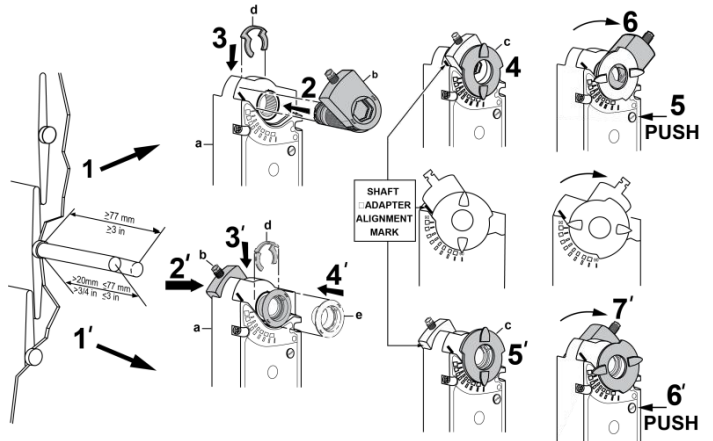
Shaft Adapter Placement for Counterclockwise Rotation on Short and Long Shafts.
